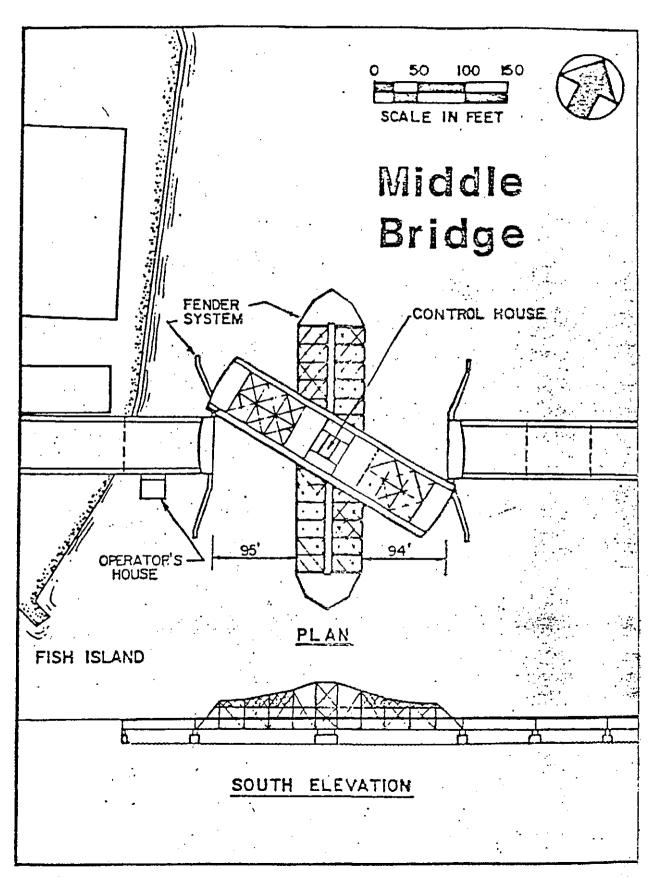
Plan of New Bedford-Fairhaven Middle Bridge. (Sverdrup, Parcel & Associates, 1979.)
